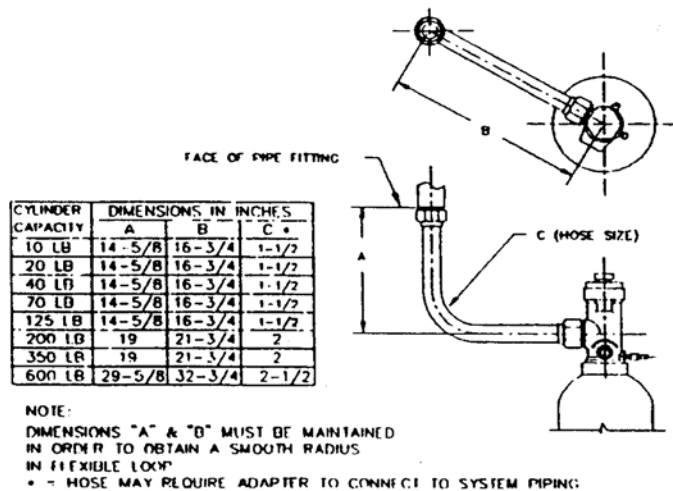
Installation of the Flexible Hose Directly into System Piping
